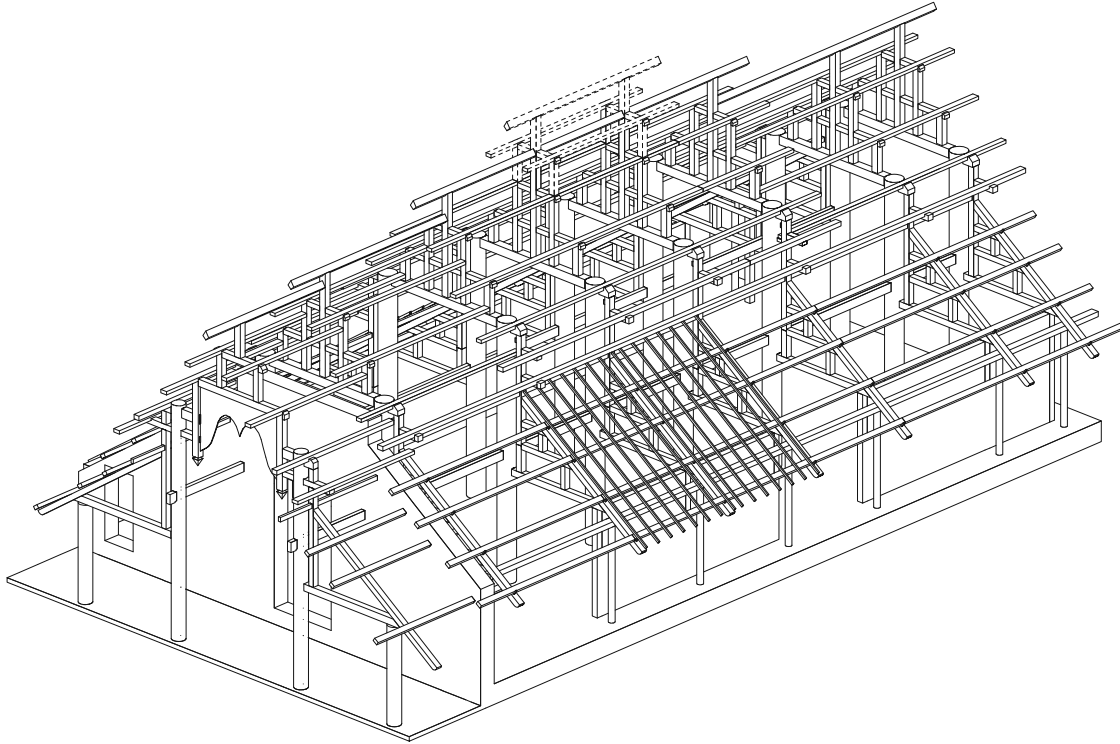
Axonometric view of the viharn of Baan Kyen monastery showing purlin and roof shaping member
